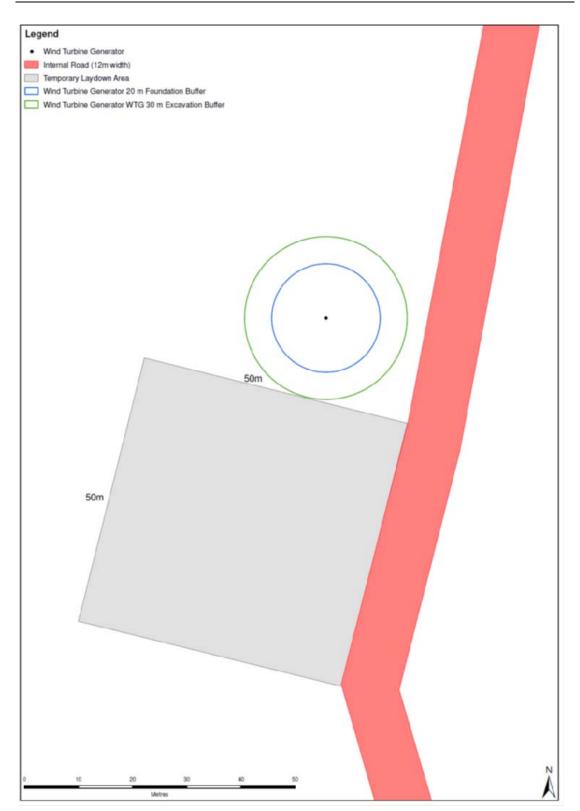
Typical drawing showing wind turbine, internal road and laydown area footprints.
